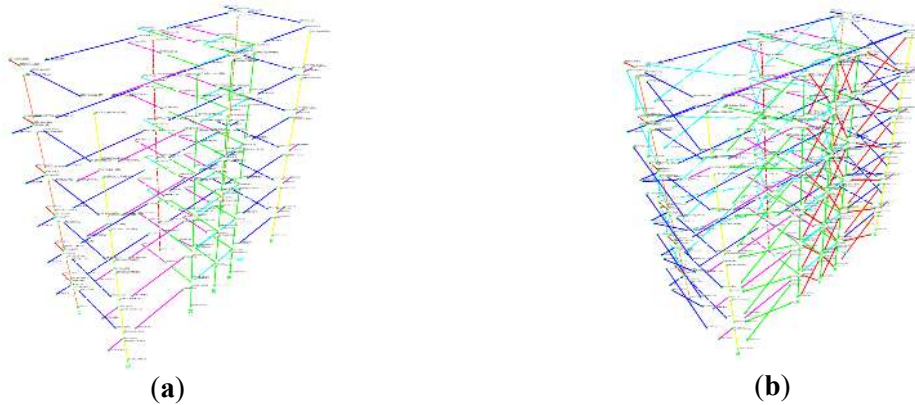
Three-dimensional view of model with hinges (a) model with infill wall; (b) model without infill wall
